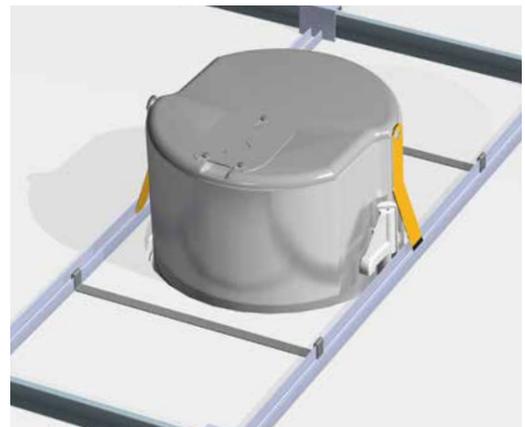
Drop-stop tabs (highlighted) snap out over bridge support rails
